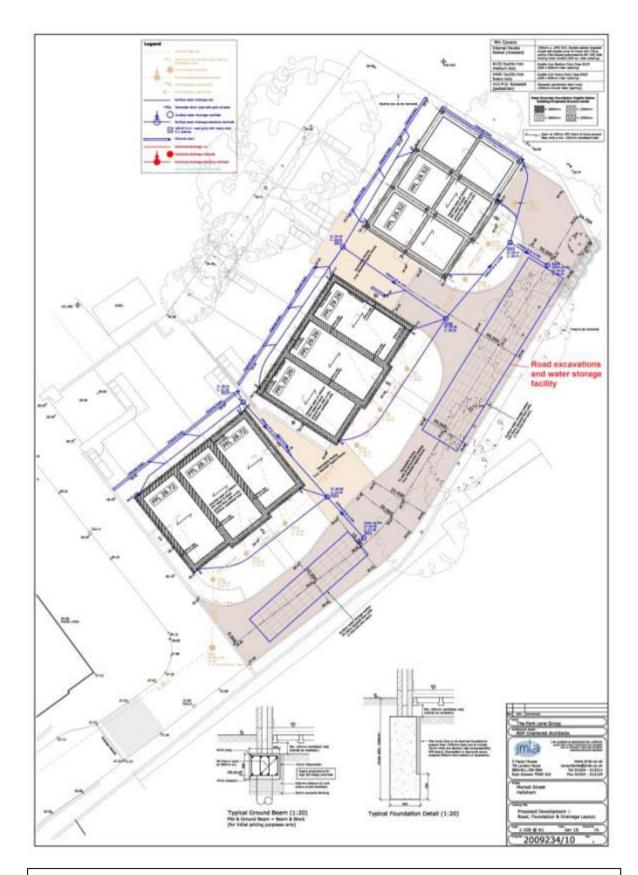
Land at Burtenshaw Lane, Market Street, Hailsham: Site Plan showing new dwelling foundations, drainage and road areas monitored during the watching brief (adapted from plan provided by Park Lane Group)
